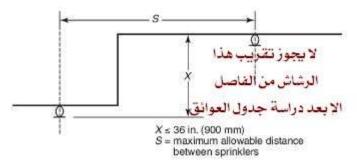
(B) Vertical Change in Ceiling Elevation Less Than or Equal to 36 in. (900 mm).
